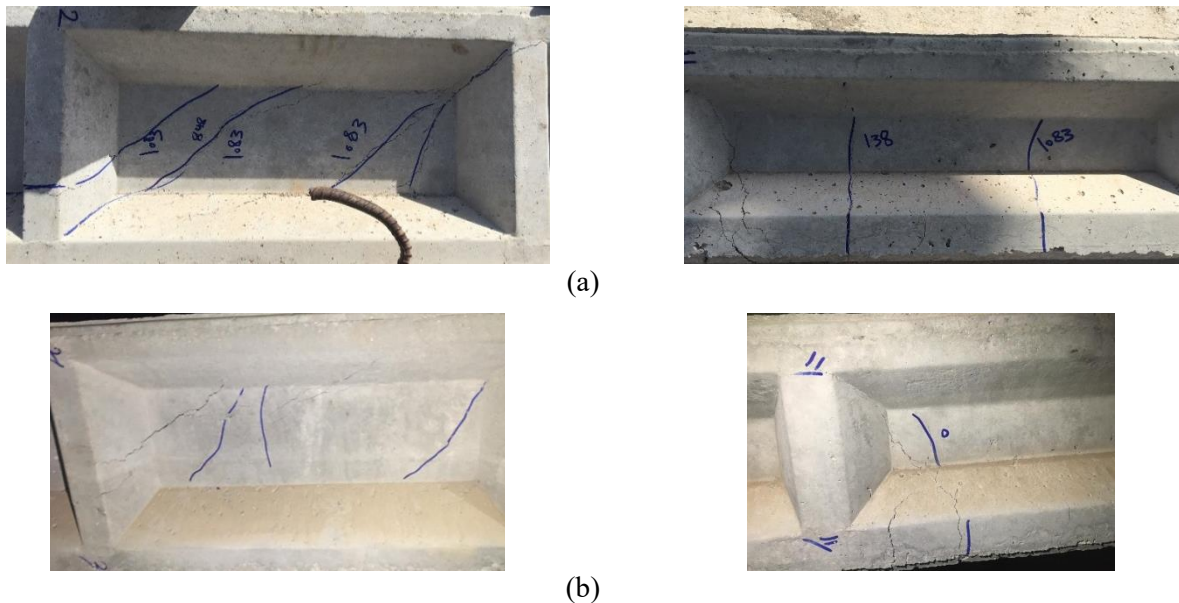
Cracking status in: a) 12-400-30-1, and b) 12-400-30-2.
